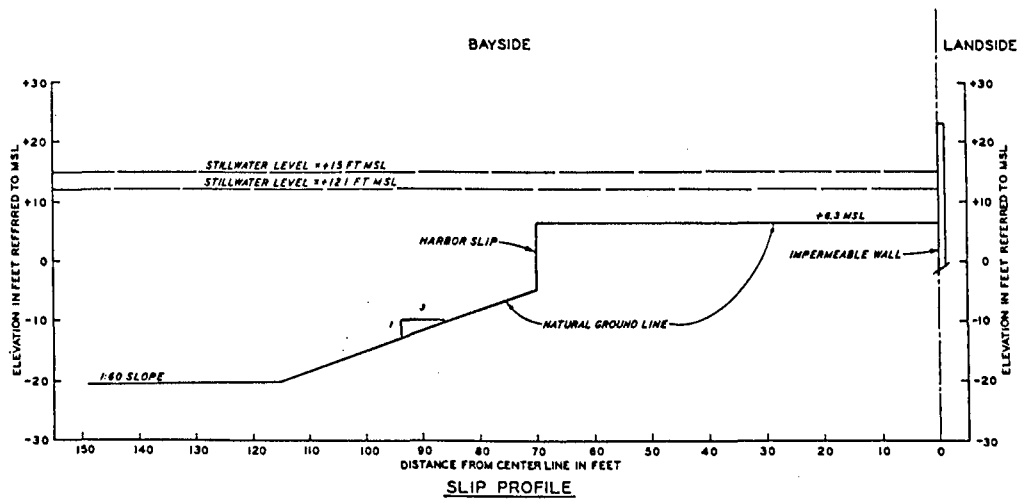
Elements of test section (plan 6), Texas City seawall model (Jackson, 1966).
